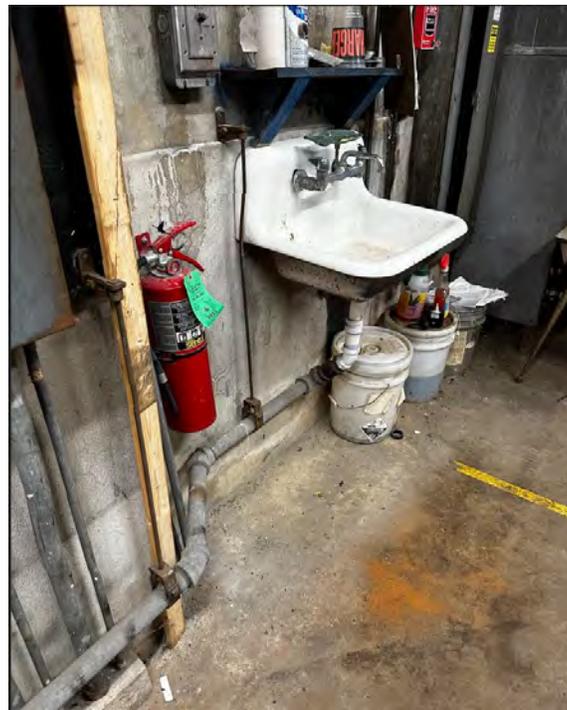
Basement Sink with Piping Drained into Waste Sump Pump
